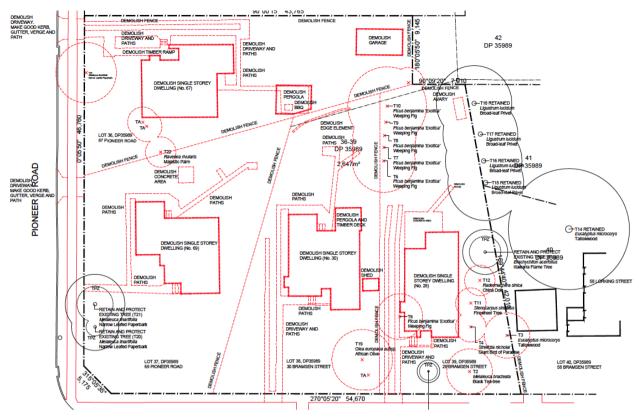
Extract of demolition plan showing trees to be removed (Source: McIntosch and Phelps)
